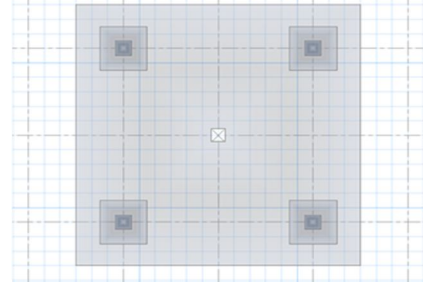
slab with drop - opening of (445mmx 445mm)
